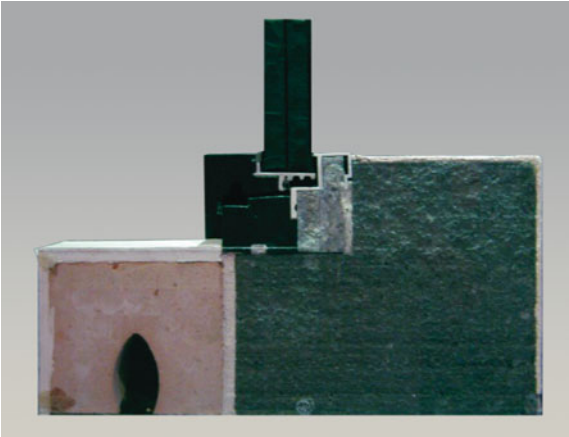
The three-layered window structure exhibited in Broad Pavilion
